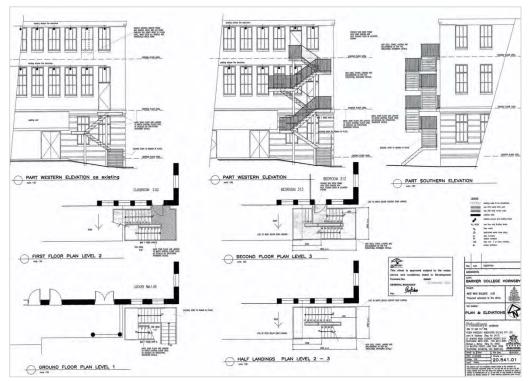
Approved and stamped plans and elevations for alterations to the West Wing, prepared by Priestley's architects, dated 1 August 2006. (Source: Hornsby Shire Council, Online DA Tracker, DA/1826/2006, 91 Pacific Highway, Hornsby)
